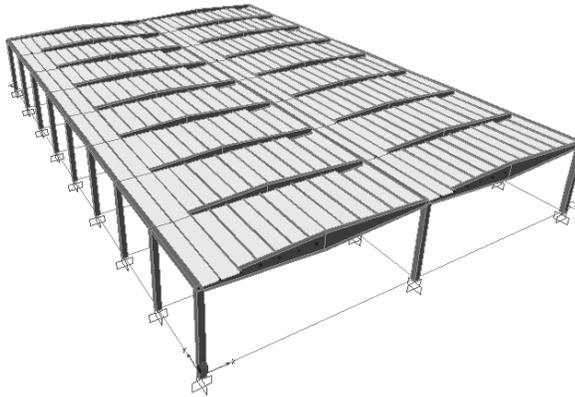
Structural System of Building 2 (Demiralan 2009)
